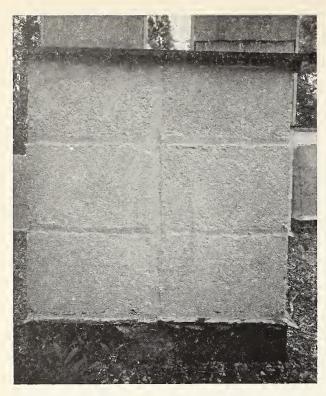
Specimen of cinder-concrete block painted with oil paint over base coat of grout.
